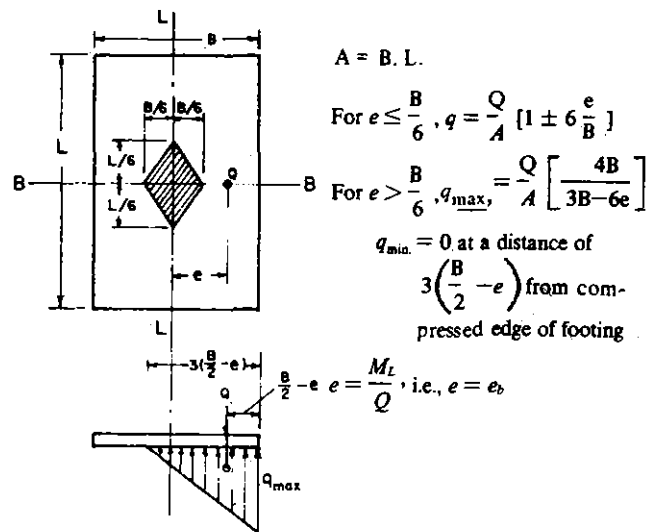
Rectangular footing, load on one of the center lines of footing
